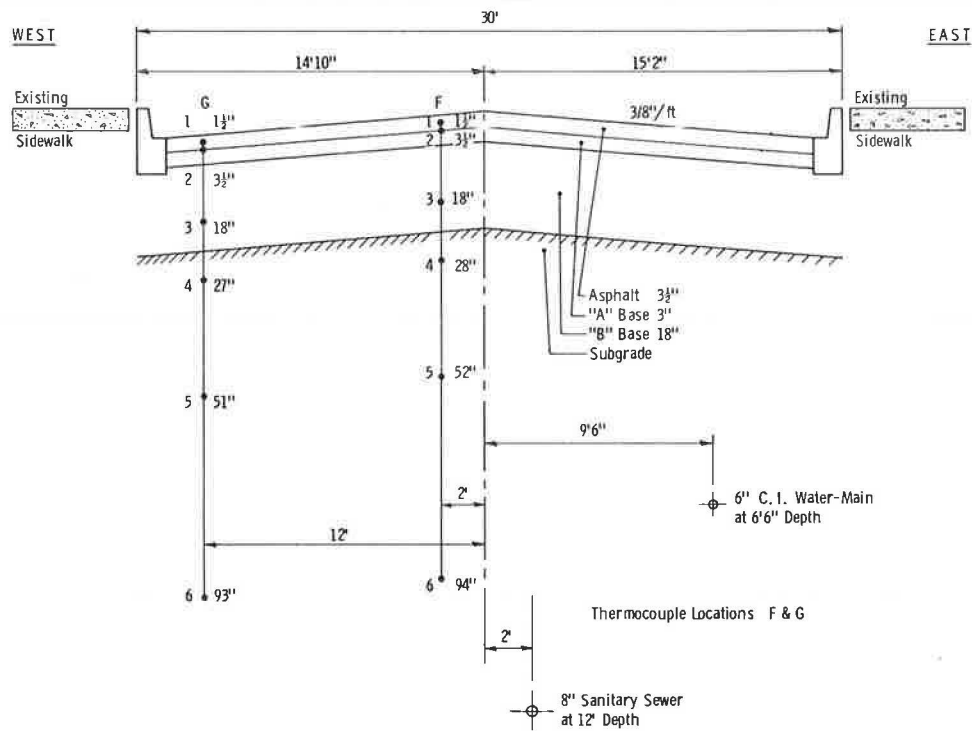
Pavement design and thermocouple locations of control section at Station 6+10, Antwerp Street.
